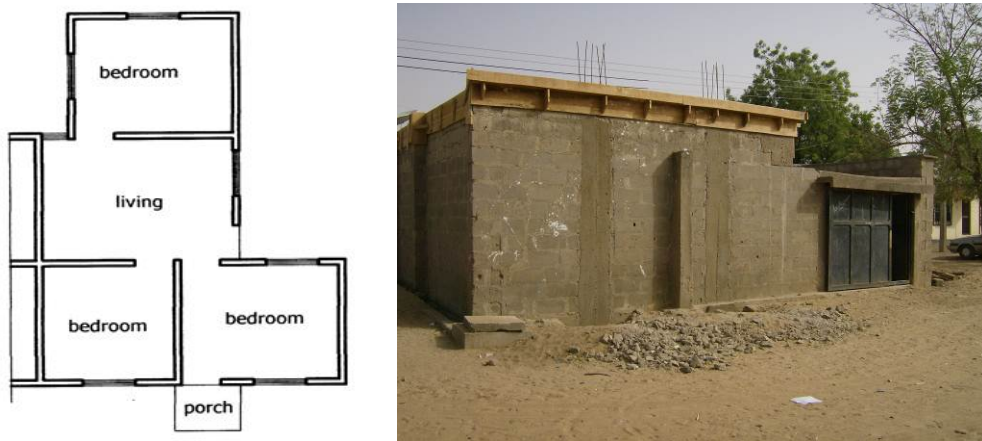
Plan and view of redesigned house converted to 3 bedrooms with high fence wall and gate.
